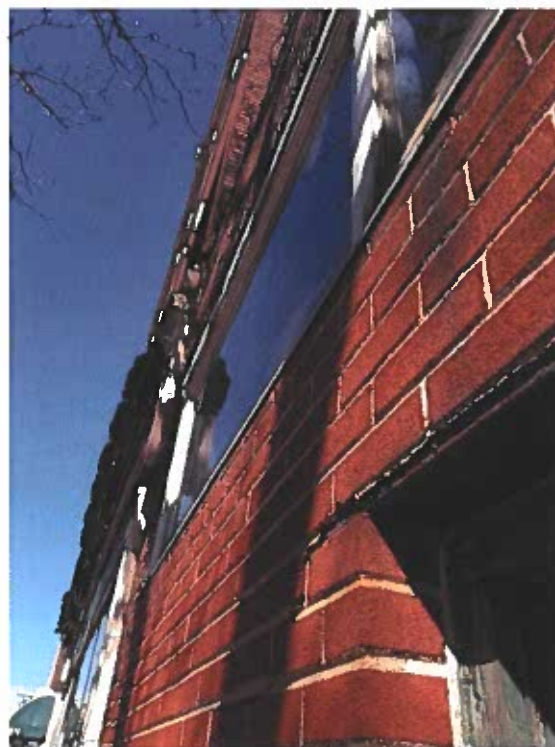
Façade pulled away from the door lintel approximately 1”.
